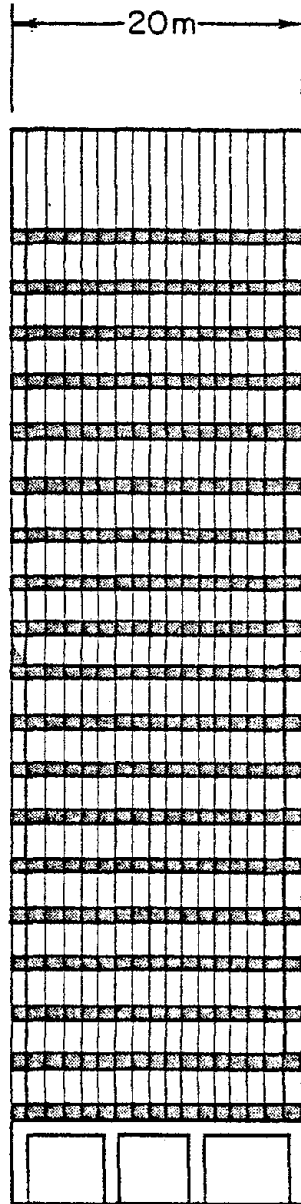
Elevation View of the Arts Tower in the Short Direction.
